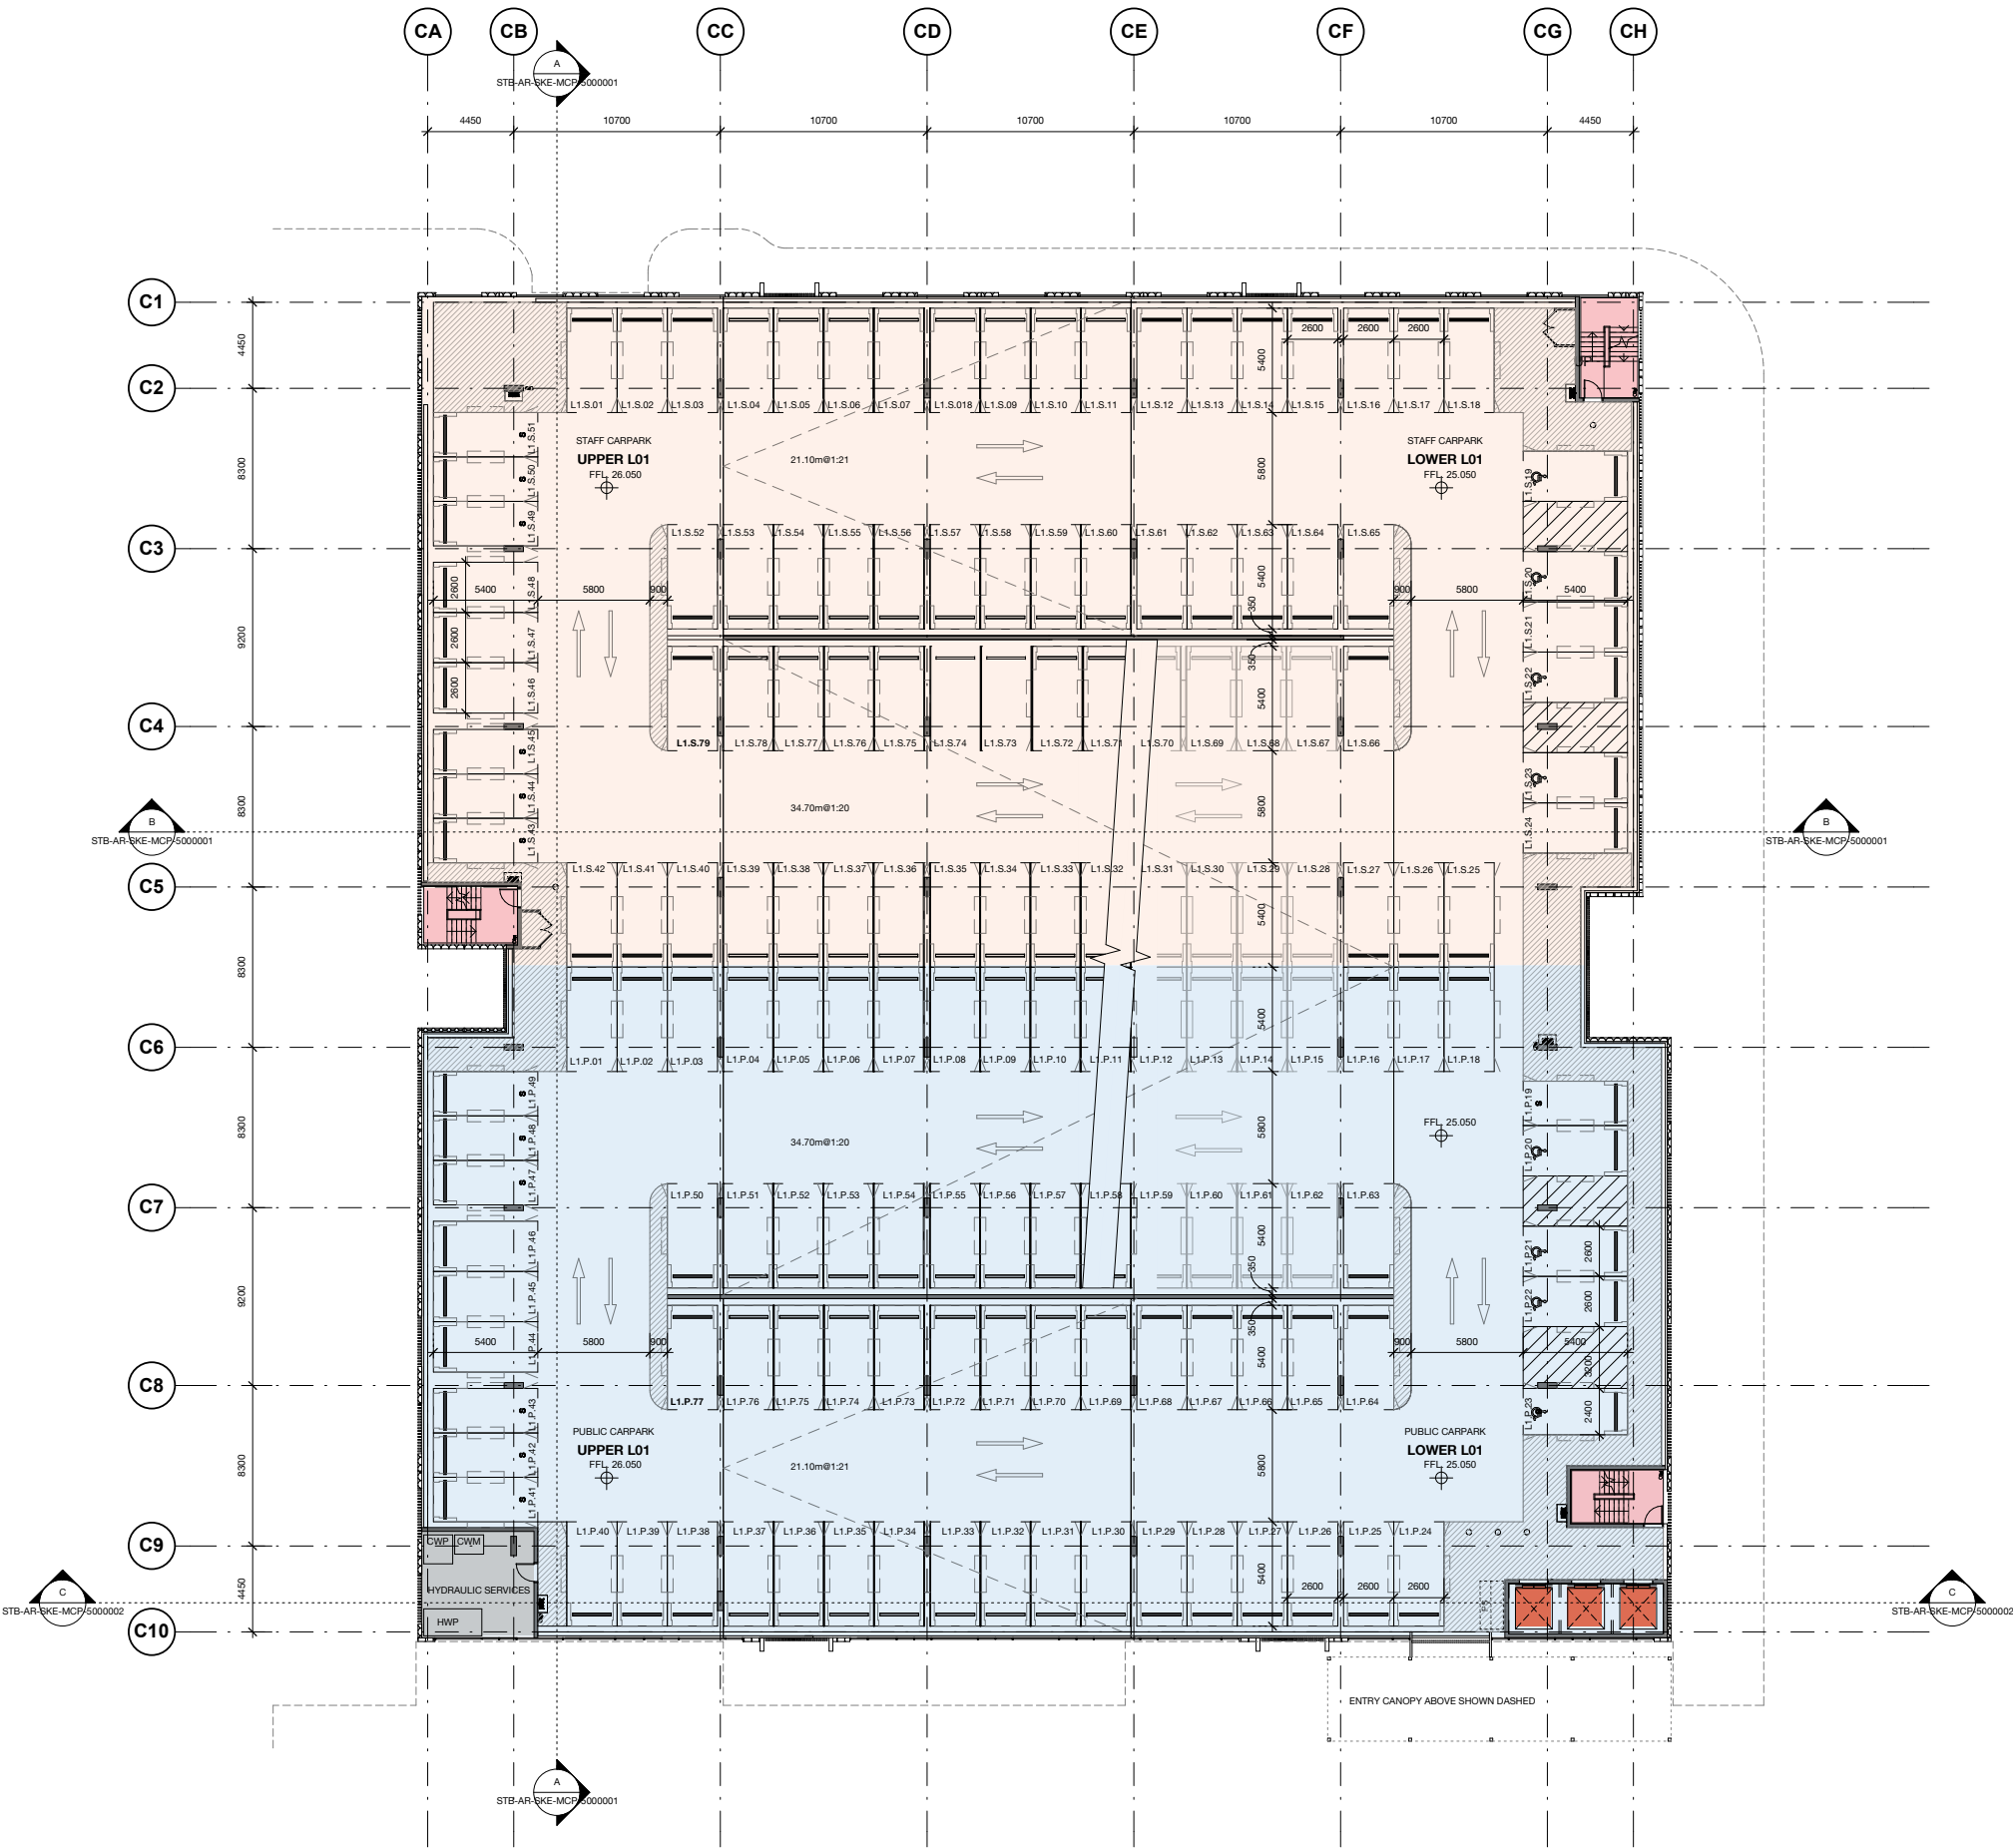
Multi-Deck Carpark, Floor Plan - Level 1
